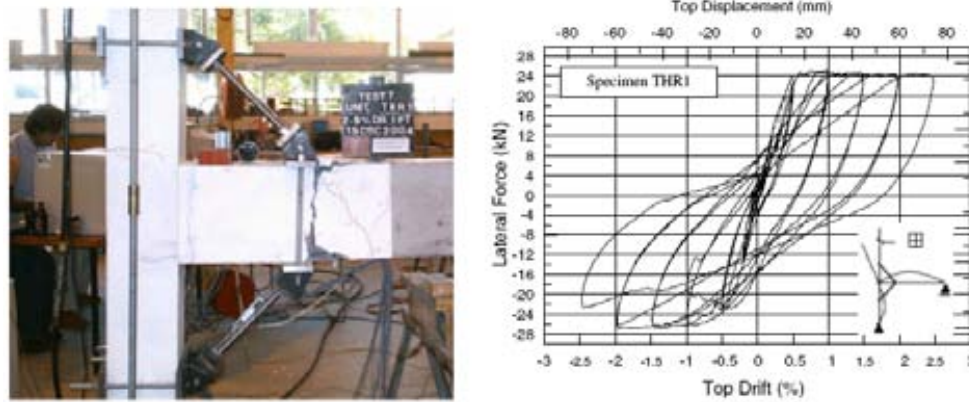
Steel haunch retrofit for exterior beam-column joints [143].
